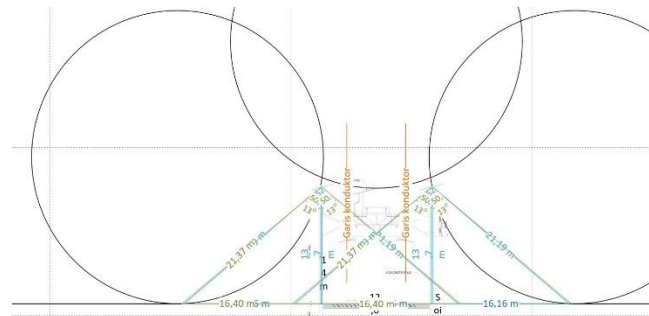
Protection Zone Side View of OCS V-Truss Beam Pole with Striking Distance 34.43 m
